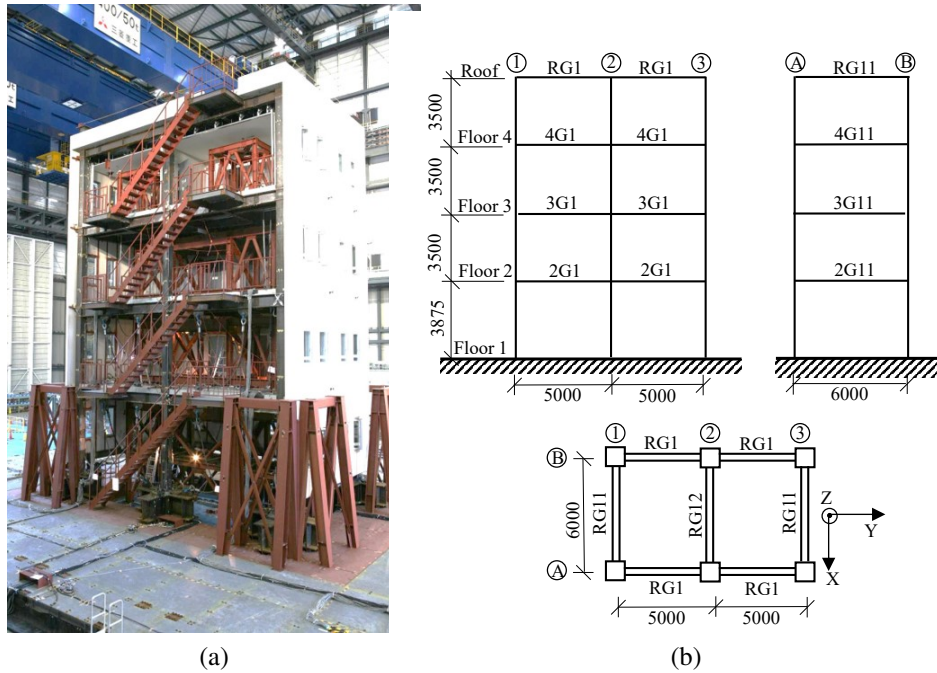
Case study building: (a) building overview after construction [image adopted from [25]] and (b) elevation and plan views
